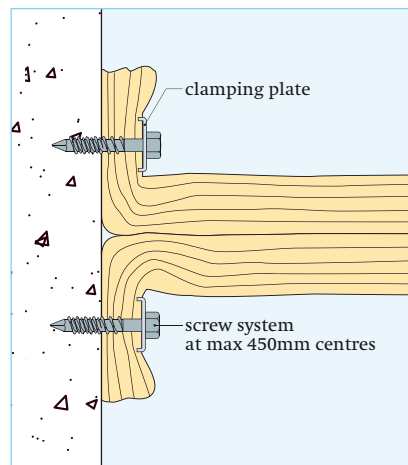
One hour Fire Barrier Perimeter fixing – Plan view
